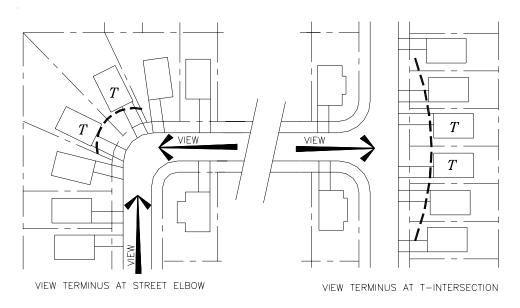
Conceptual plan view of view terminus dwellings
